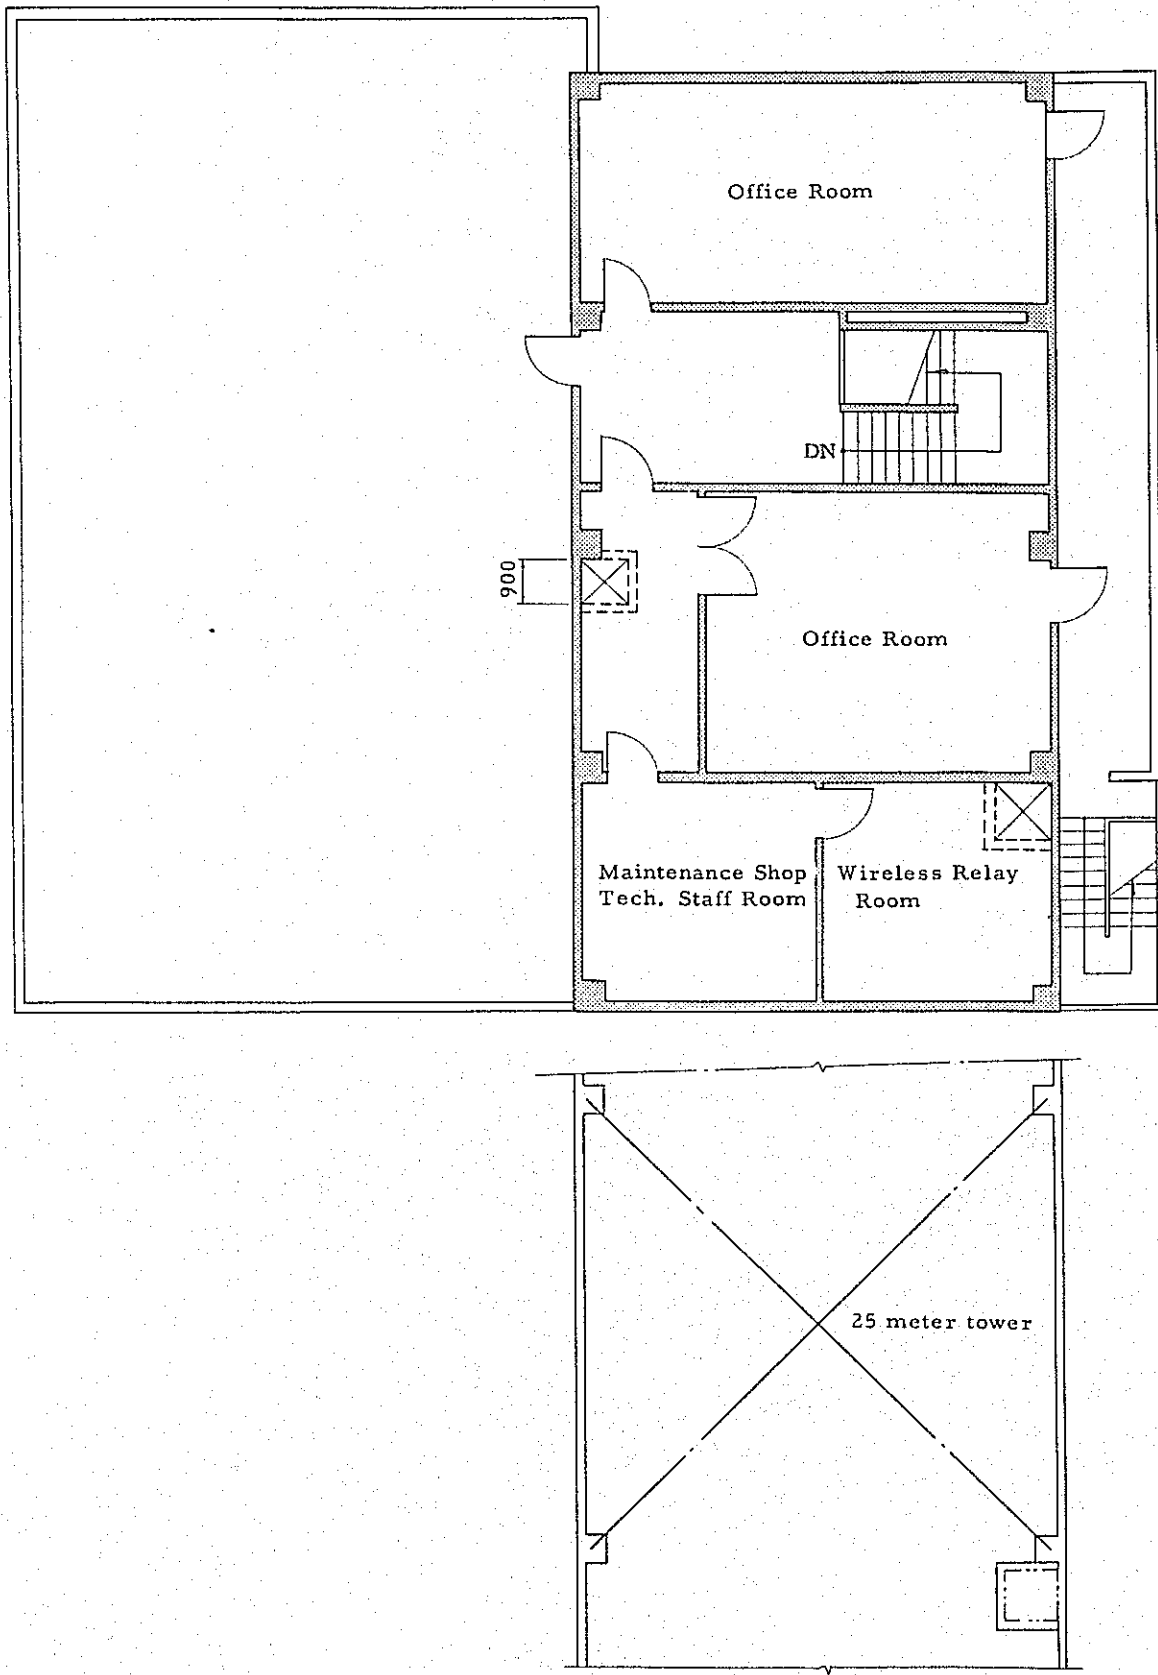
Lay out PLAN of New Radio Studio Building - 4F & Roof PLAN
